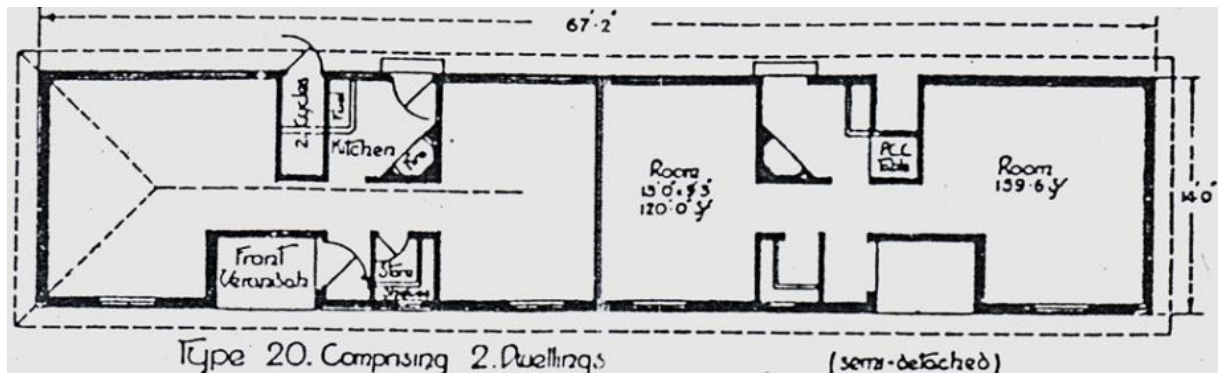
Floor plan of a 2-roomed semi-detached unit in Kaloleni (Ogilvie, 1946)
